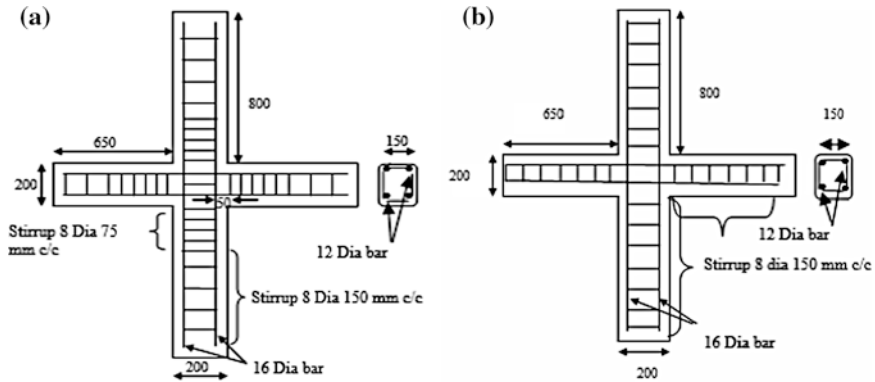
Details of the test specimens: configurations and dimensions. a D-Type. b B-Type
